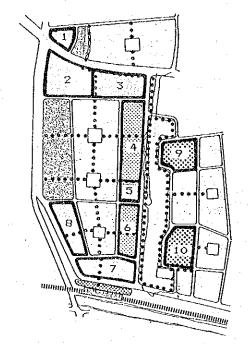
BLDG. CONSTRUCTION SITE LAYOUT
